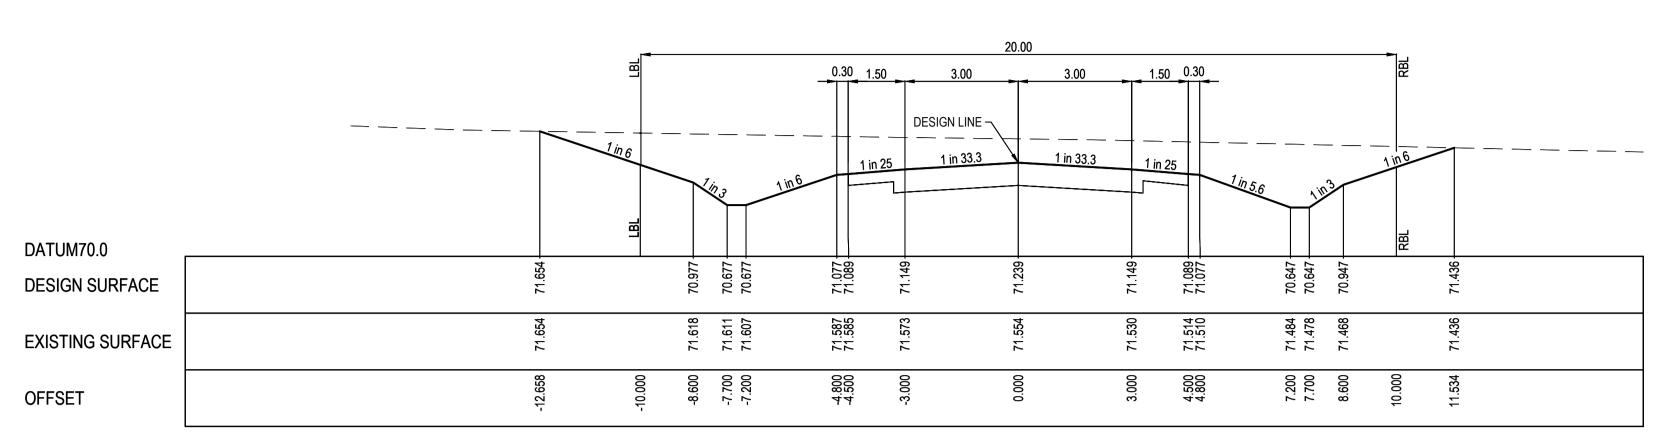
Drawing ROAD CROSS SECTIONS (SHEET 2 OF 15) PEPPERTREE HILL ROAD Sheet 09 of 22
